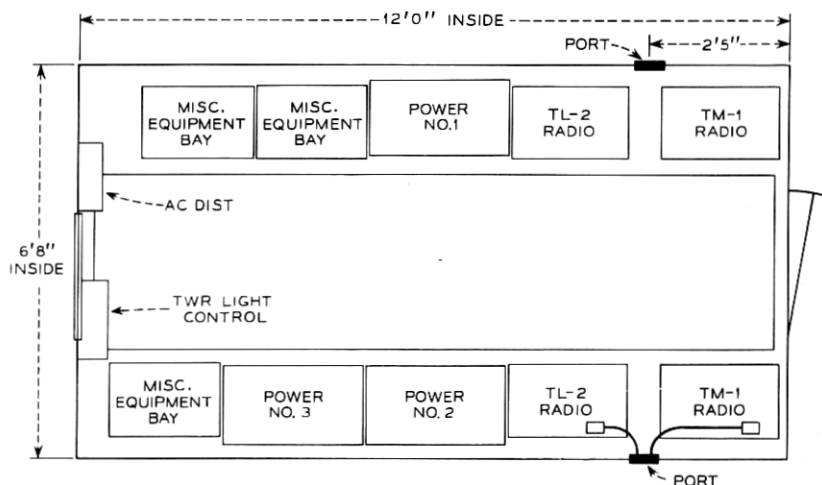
Floor plan for a TM-1/TL-2 equipment shelter showing growth plan.
